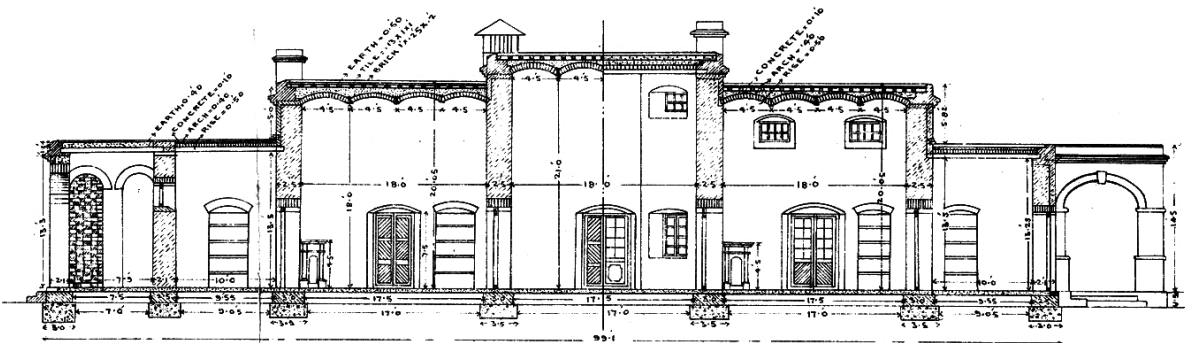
Sectional Detail of an Irrigation Inspection bungalow showing Jack Arched Roofing, Sargodah, Pakistan, 1902.
